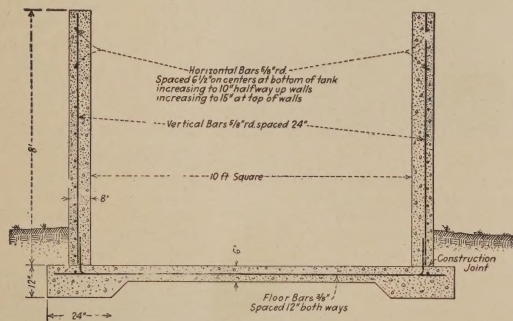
Above: Cross section of tank or cistern showing location of reinforcing. This reinforcing is located 2 inches from the outside surface of the tank walls. The reinforcing specified applies only to a tank 10 feet square or smaller and of the height given.
